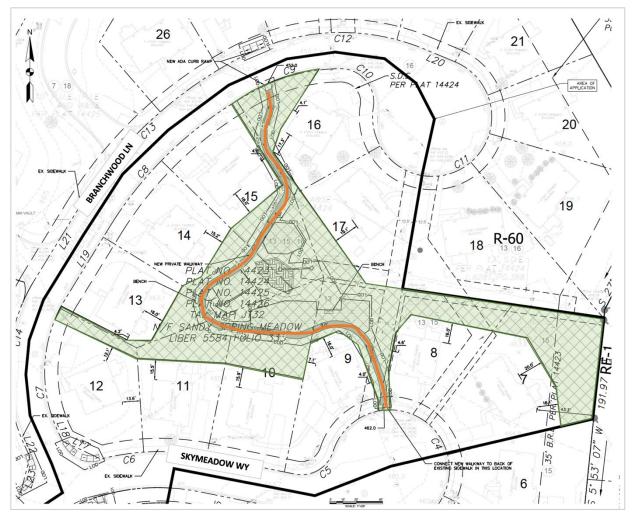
Proposed Site Plan (northern portion) showing existing open space (green) and playground area, new trail between Skymeadow Way to Branchwood Lane, with 11 existing single-family detached units to remain.
